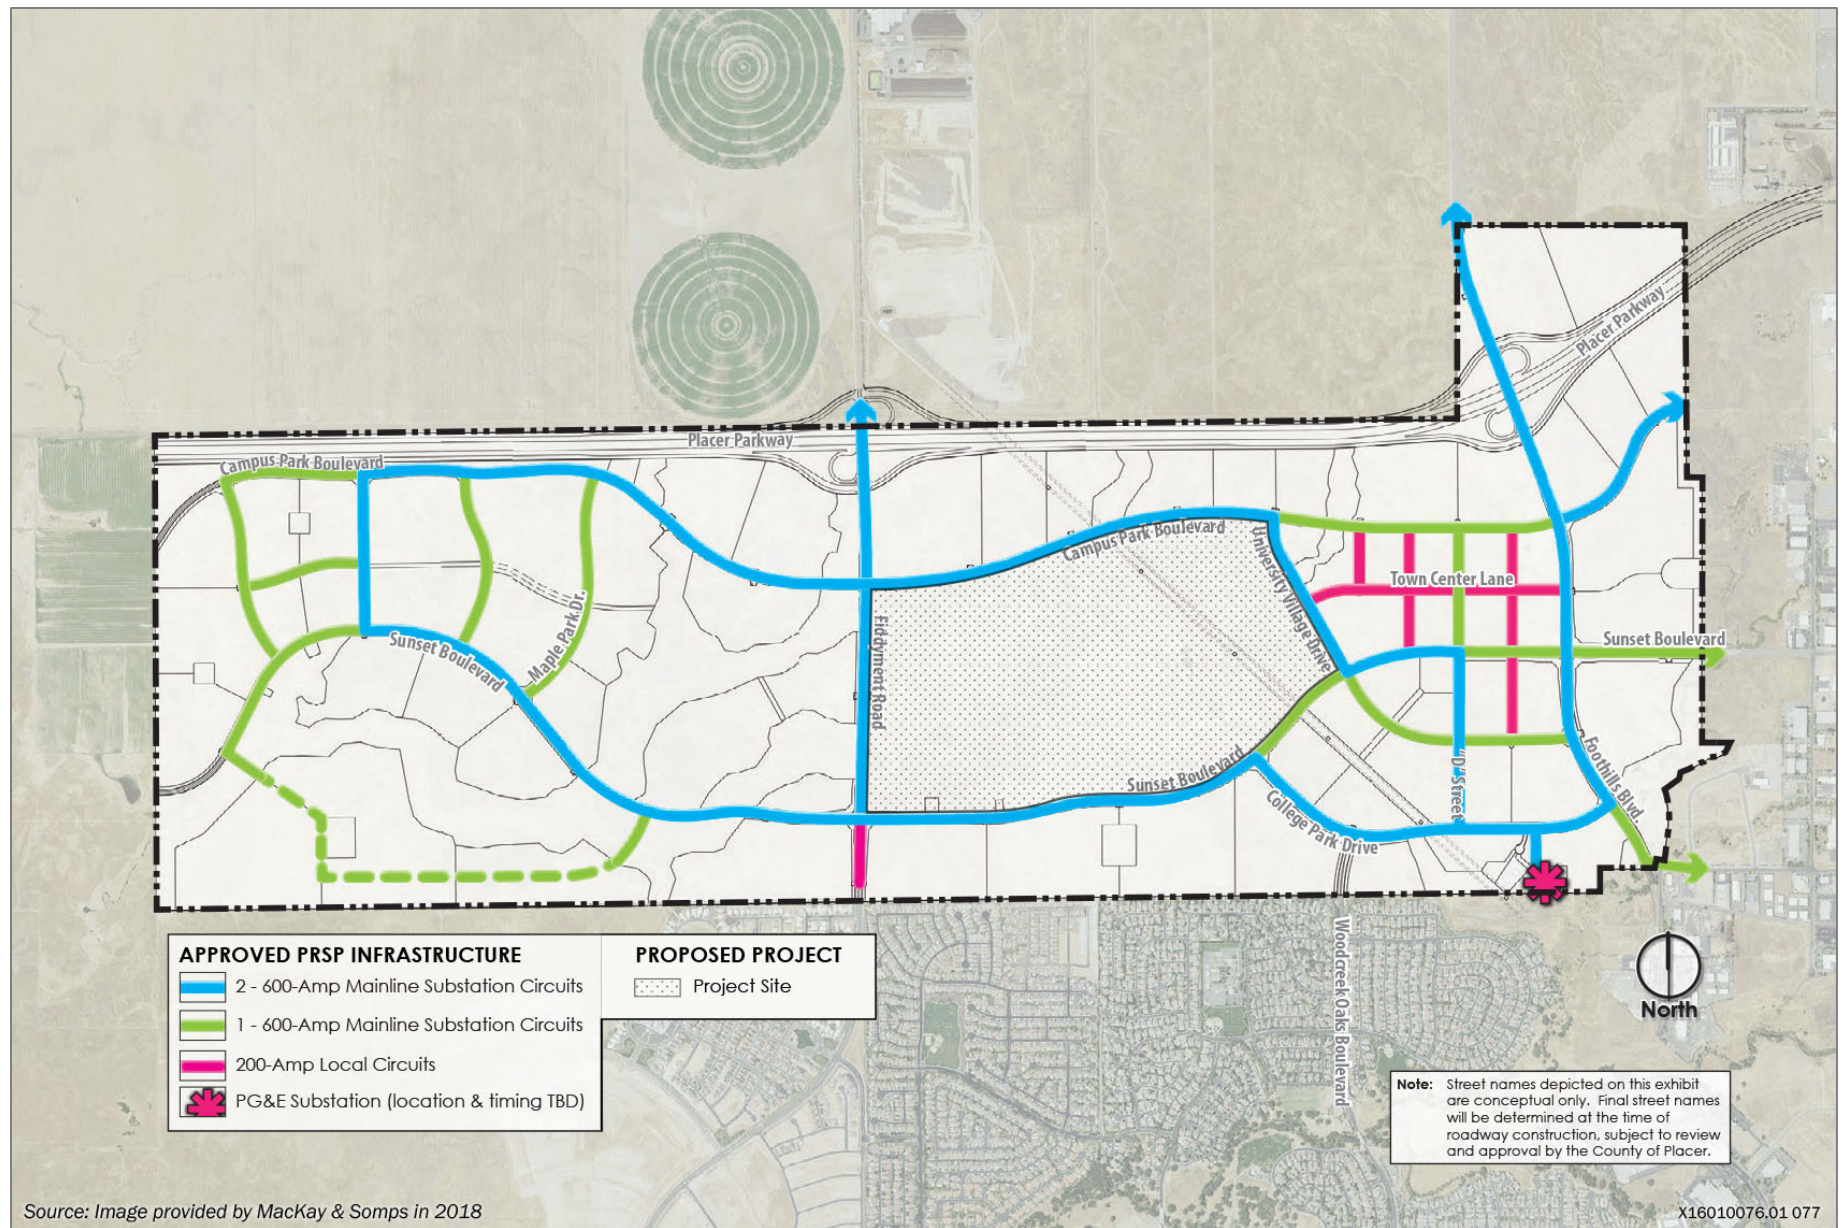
Placer Ranch Specific Plan Electric Facilities
